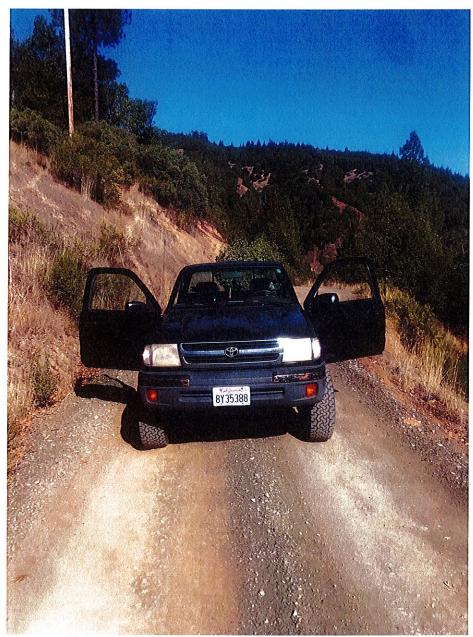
RP-8. Road width: 12'03". Turnout located at PR-9.
